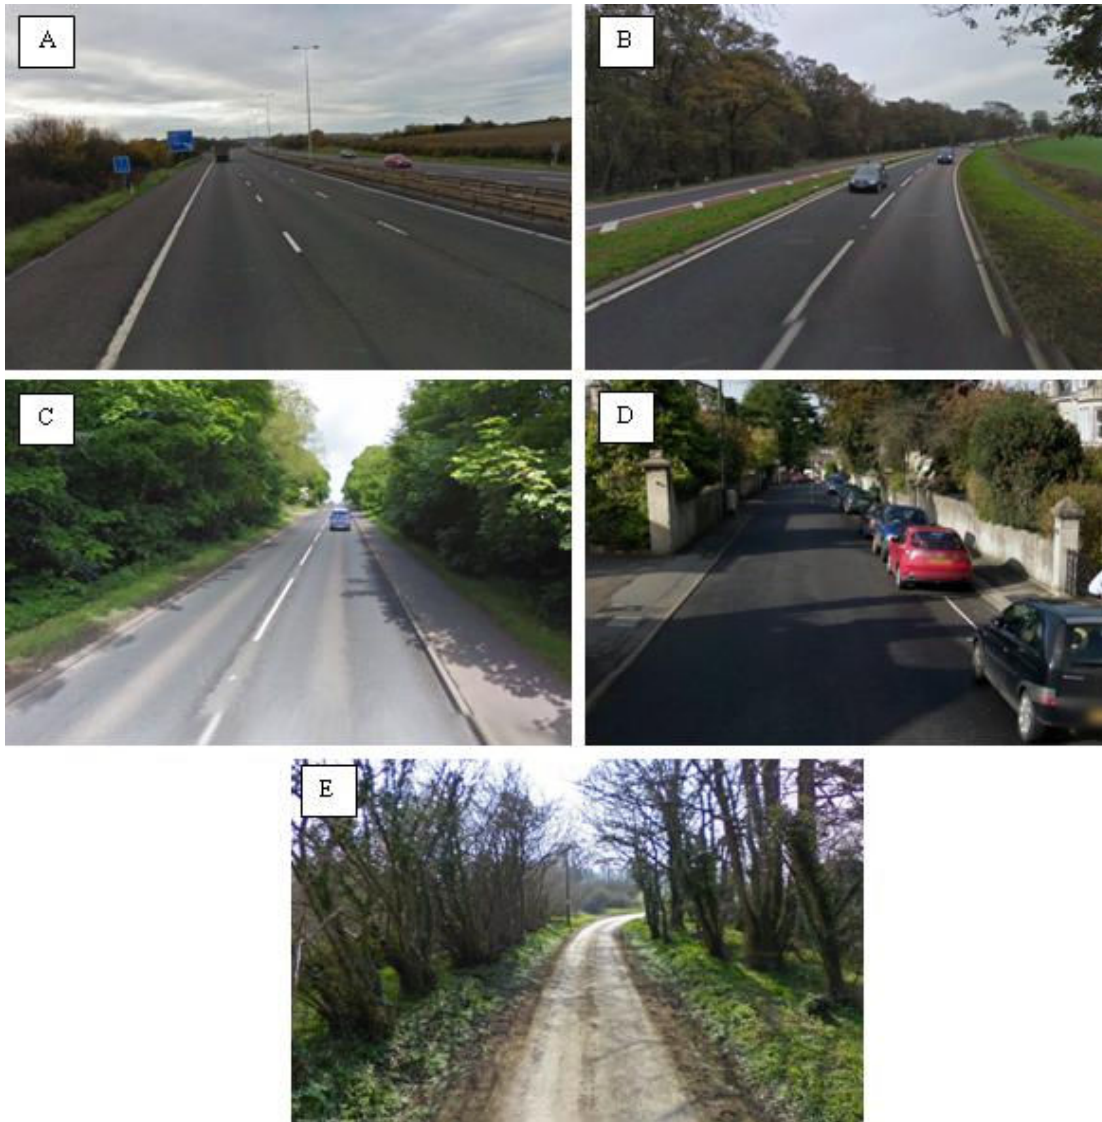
Road types (a) Motorway (b) A road (c) B road (d) B road - Residential (e) Unclassified - Country road (TAKEN FROM Google Streetview)
